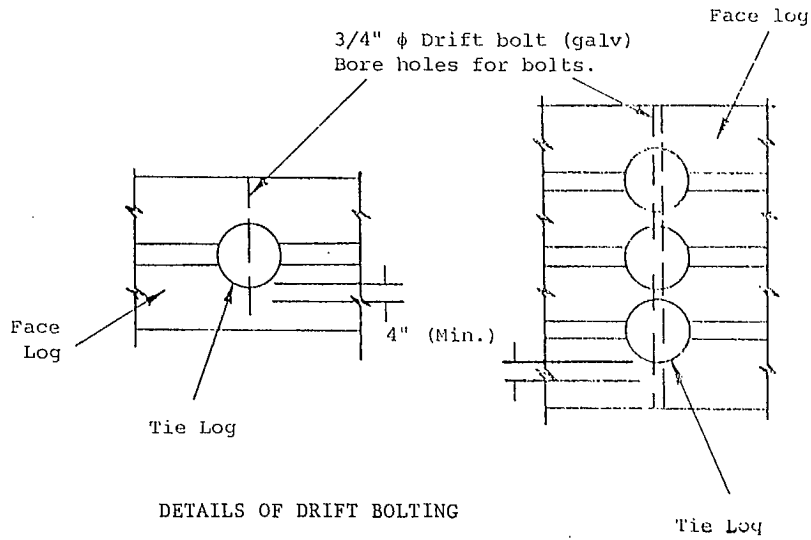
Joint details for log cribbing - U.S. Bureau of Public Roads (10).
